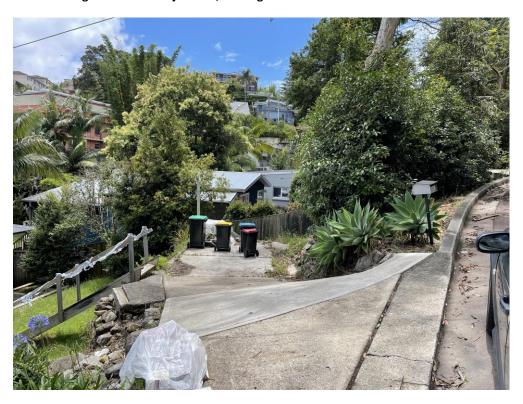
View of the existing open parking area forward of the dwelling, looking north-west from Palomar Parade
